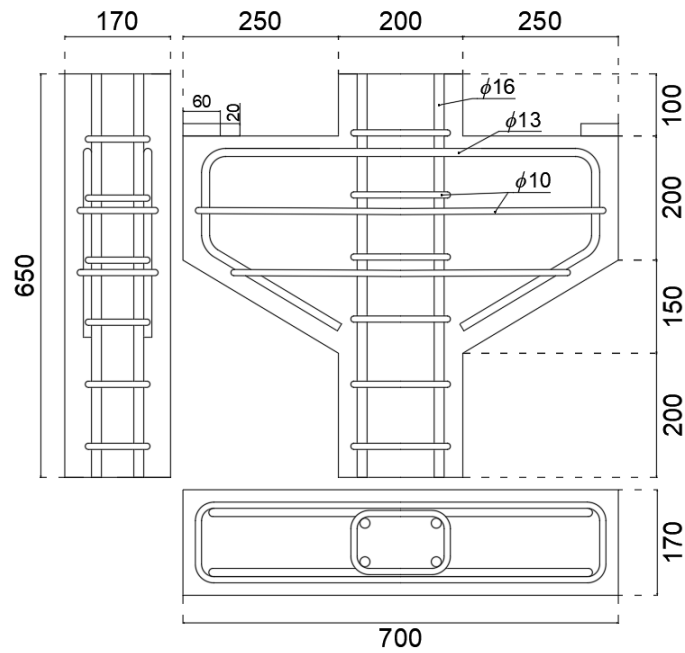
Dimensions of concrete corbel and rebar configuration in mm.
